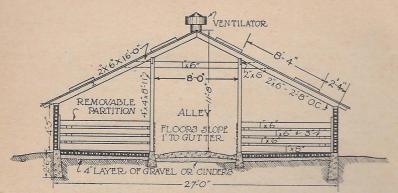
Cross section thru hog house shown in figure 1, showing roof and floor construction.
